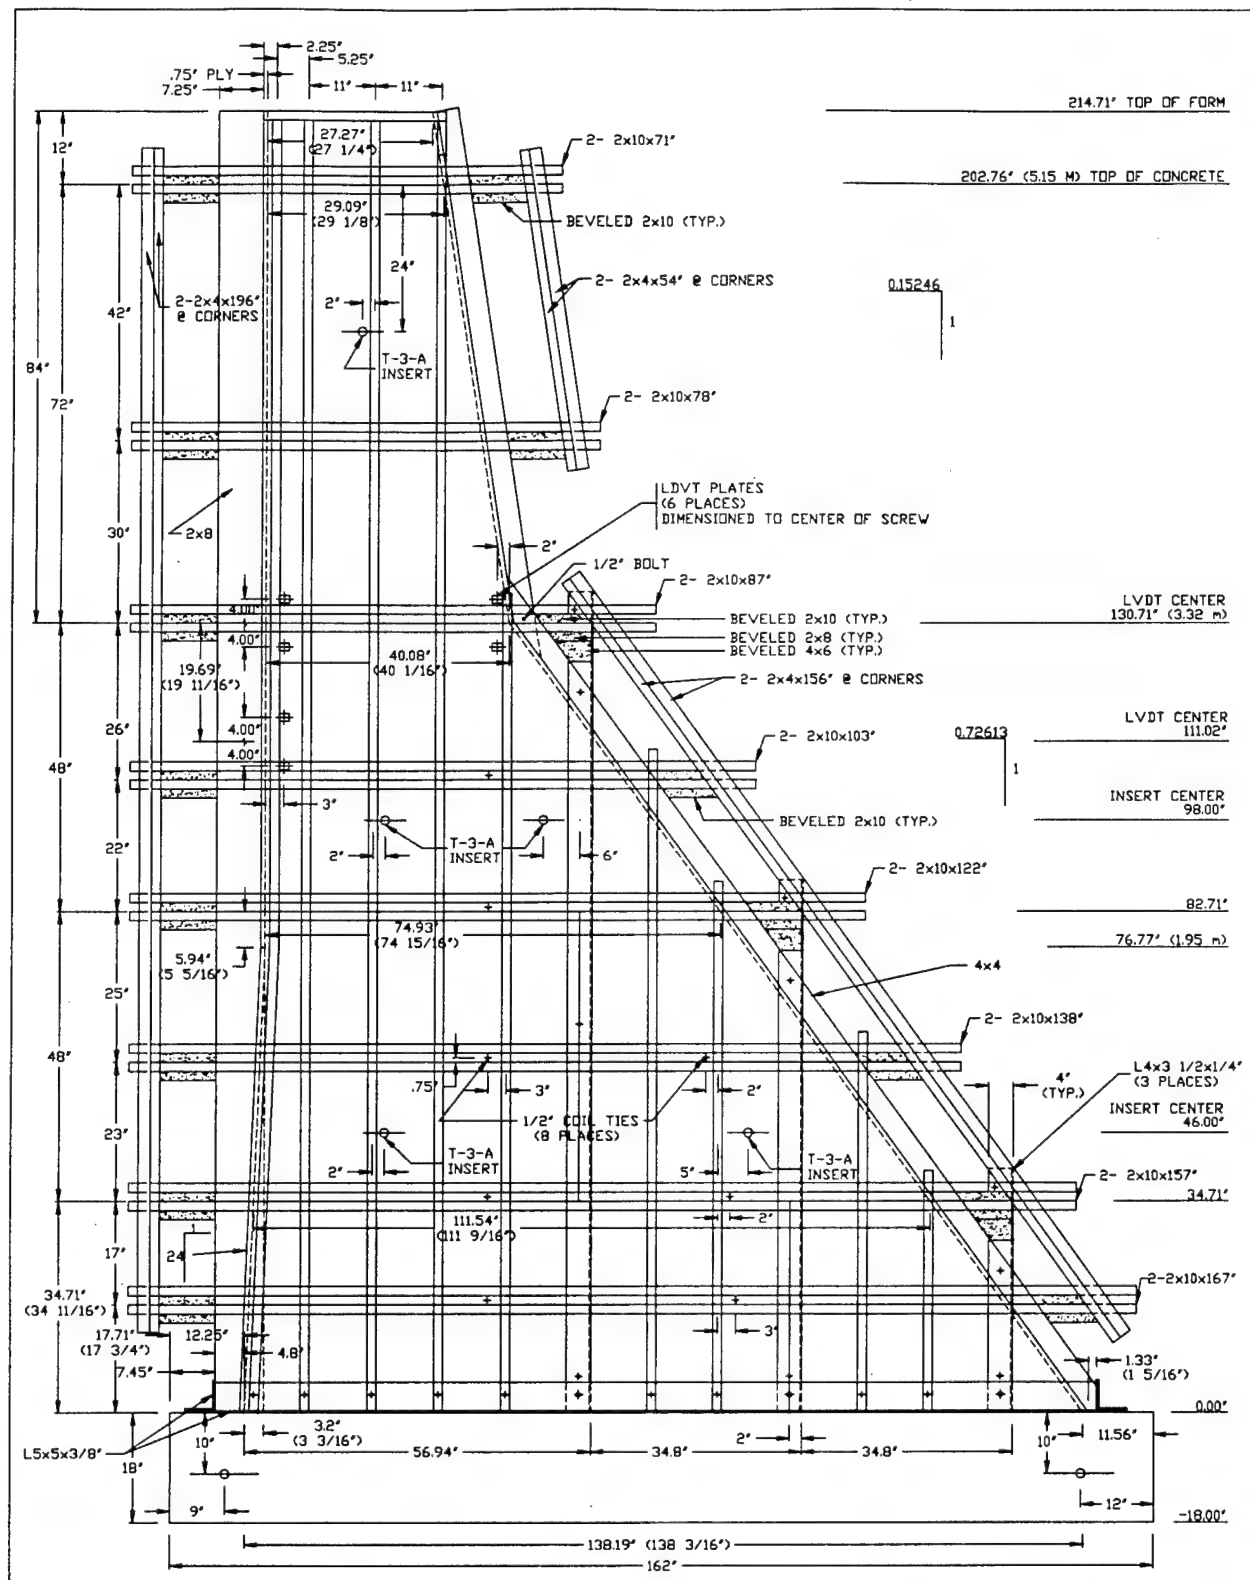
Front face formwork showing front walers, corners, a cross-section of the upstream and downstream walers, plus location of coil ties, inserts, and instrumentation plates.
